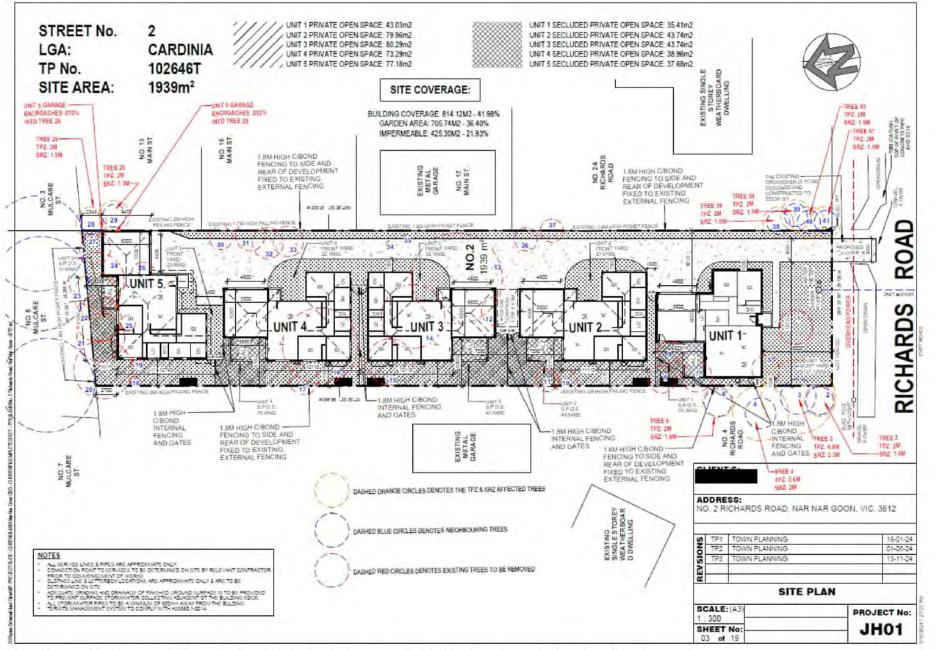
Proposed site plan supplied by the client showing proposed development layout, TPZs, SRZs and areas of TPZ encroachment
